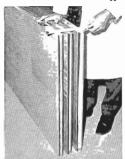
Bottom gasket used with Type-A and Type-B gaskets on the proprietary doors.
